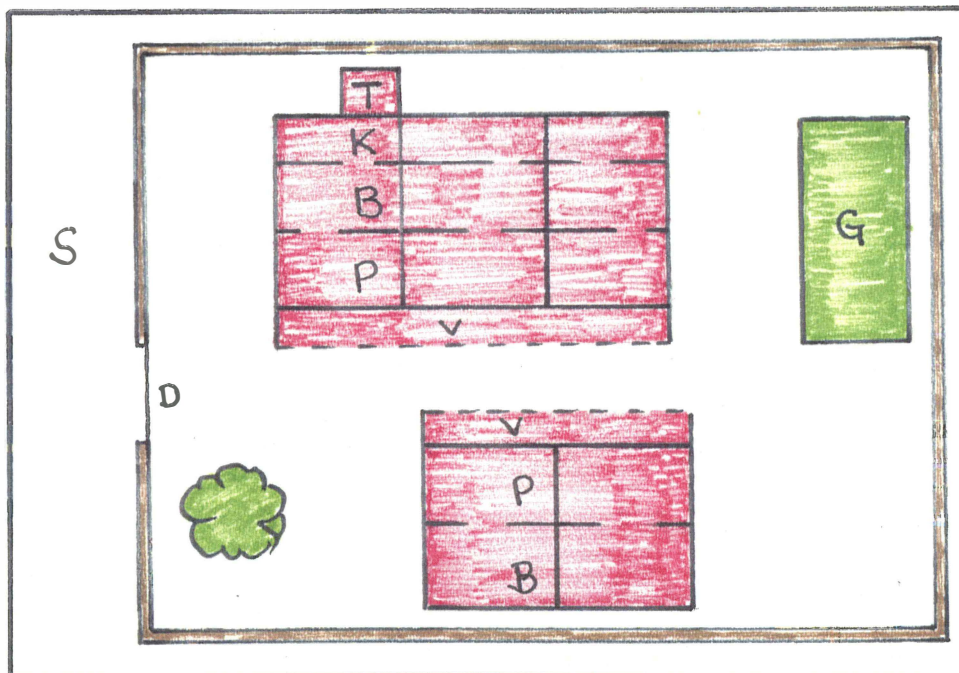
Schematic plan of a basic compound layout. S= street; D= main door entrance to compound; V= veranda; P= parlour; B= bedroom; K= kitchen; T= toilet; G= garden
